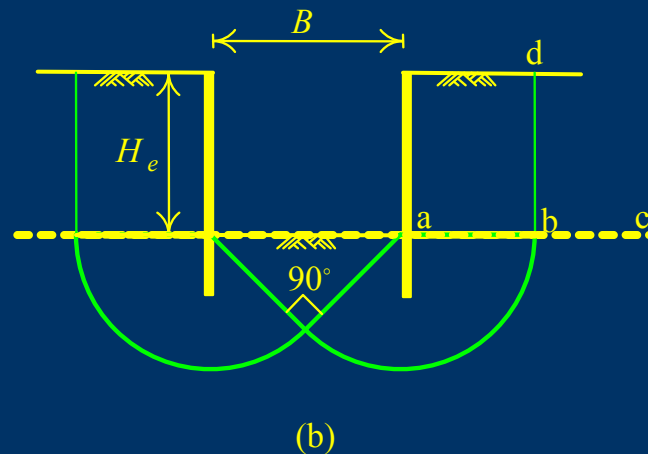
Relation between the embedded part of the retaining wall and the failure surface
